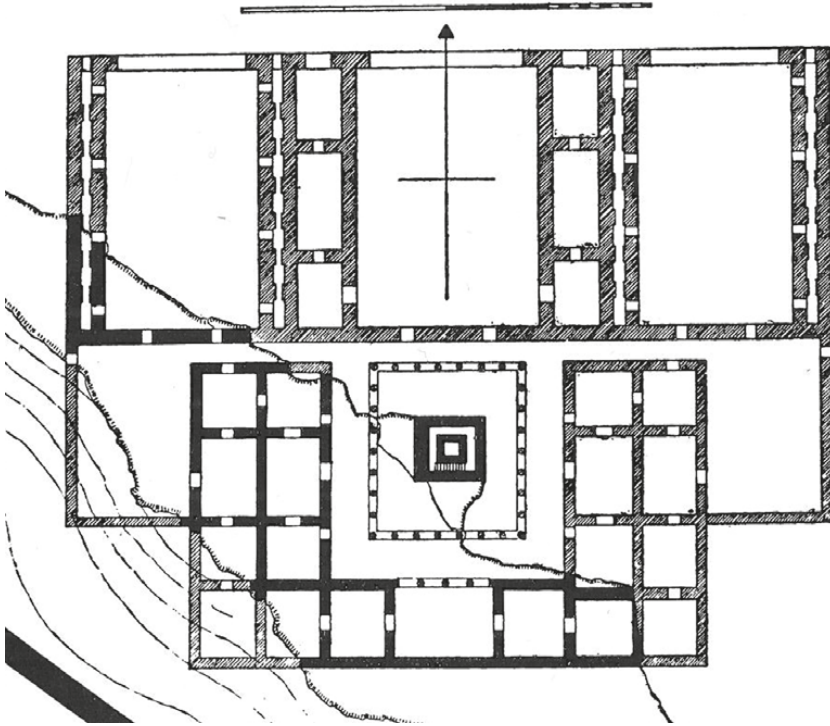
PLATE XLVIII Plan of the citadel palace, Dura-Europos, restored plan by F. Brown.
